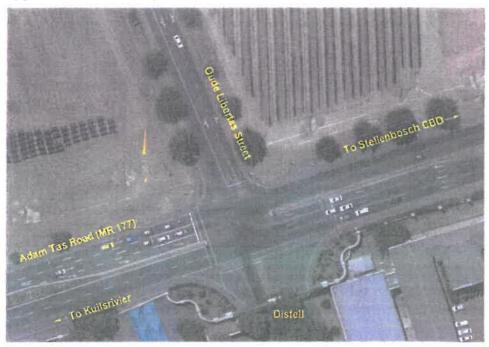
Existing Adam Tas Road/Oude Libertas Street intersection lane layout Oude Libertas Street/Distillery Road/Flamingo Road intersection:
